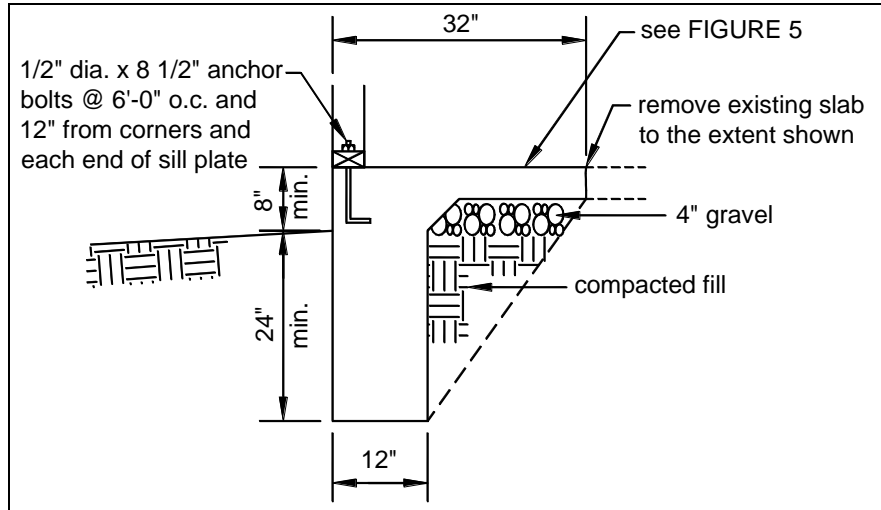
TYPICAL FOOTING/SLAB DETAIL
